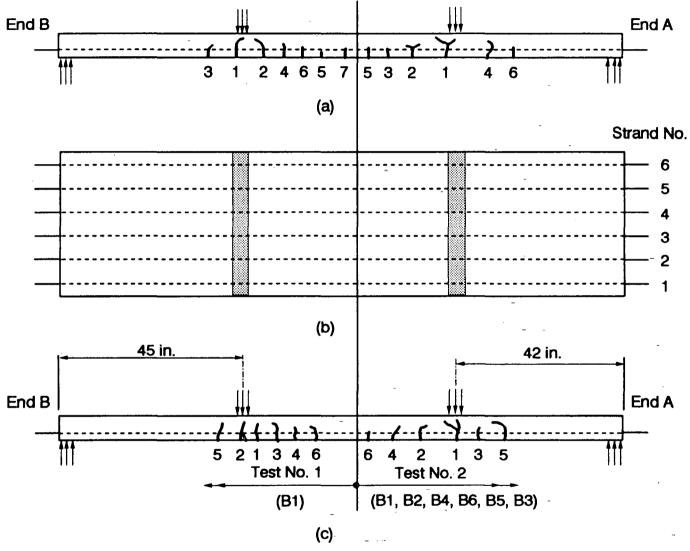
Crack patterns for D-type Specimen No. 7-6.0DU-1:
